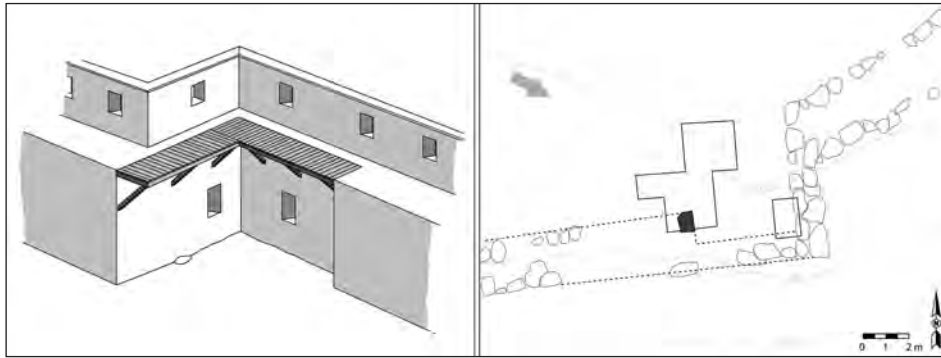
The corner and the nearby curtains as an open space. The ikria would have covered the stretch with narrower wall in the corner. Also included in the drawing are the trenches excavated in 2008. The large block found is marked with a dark colour.
